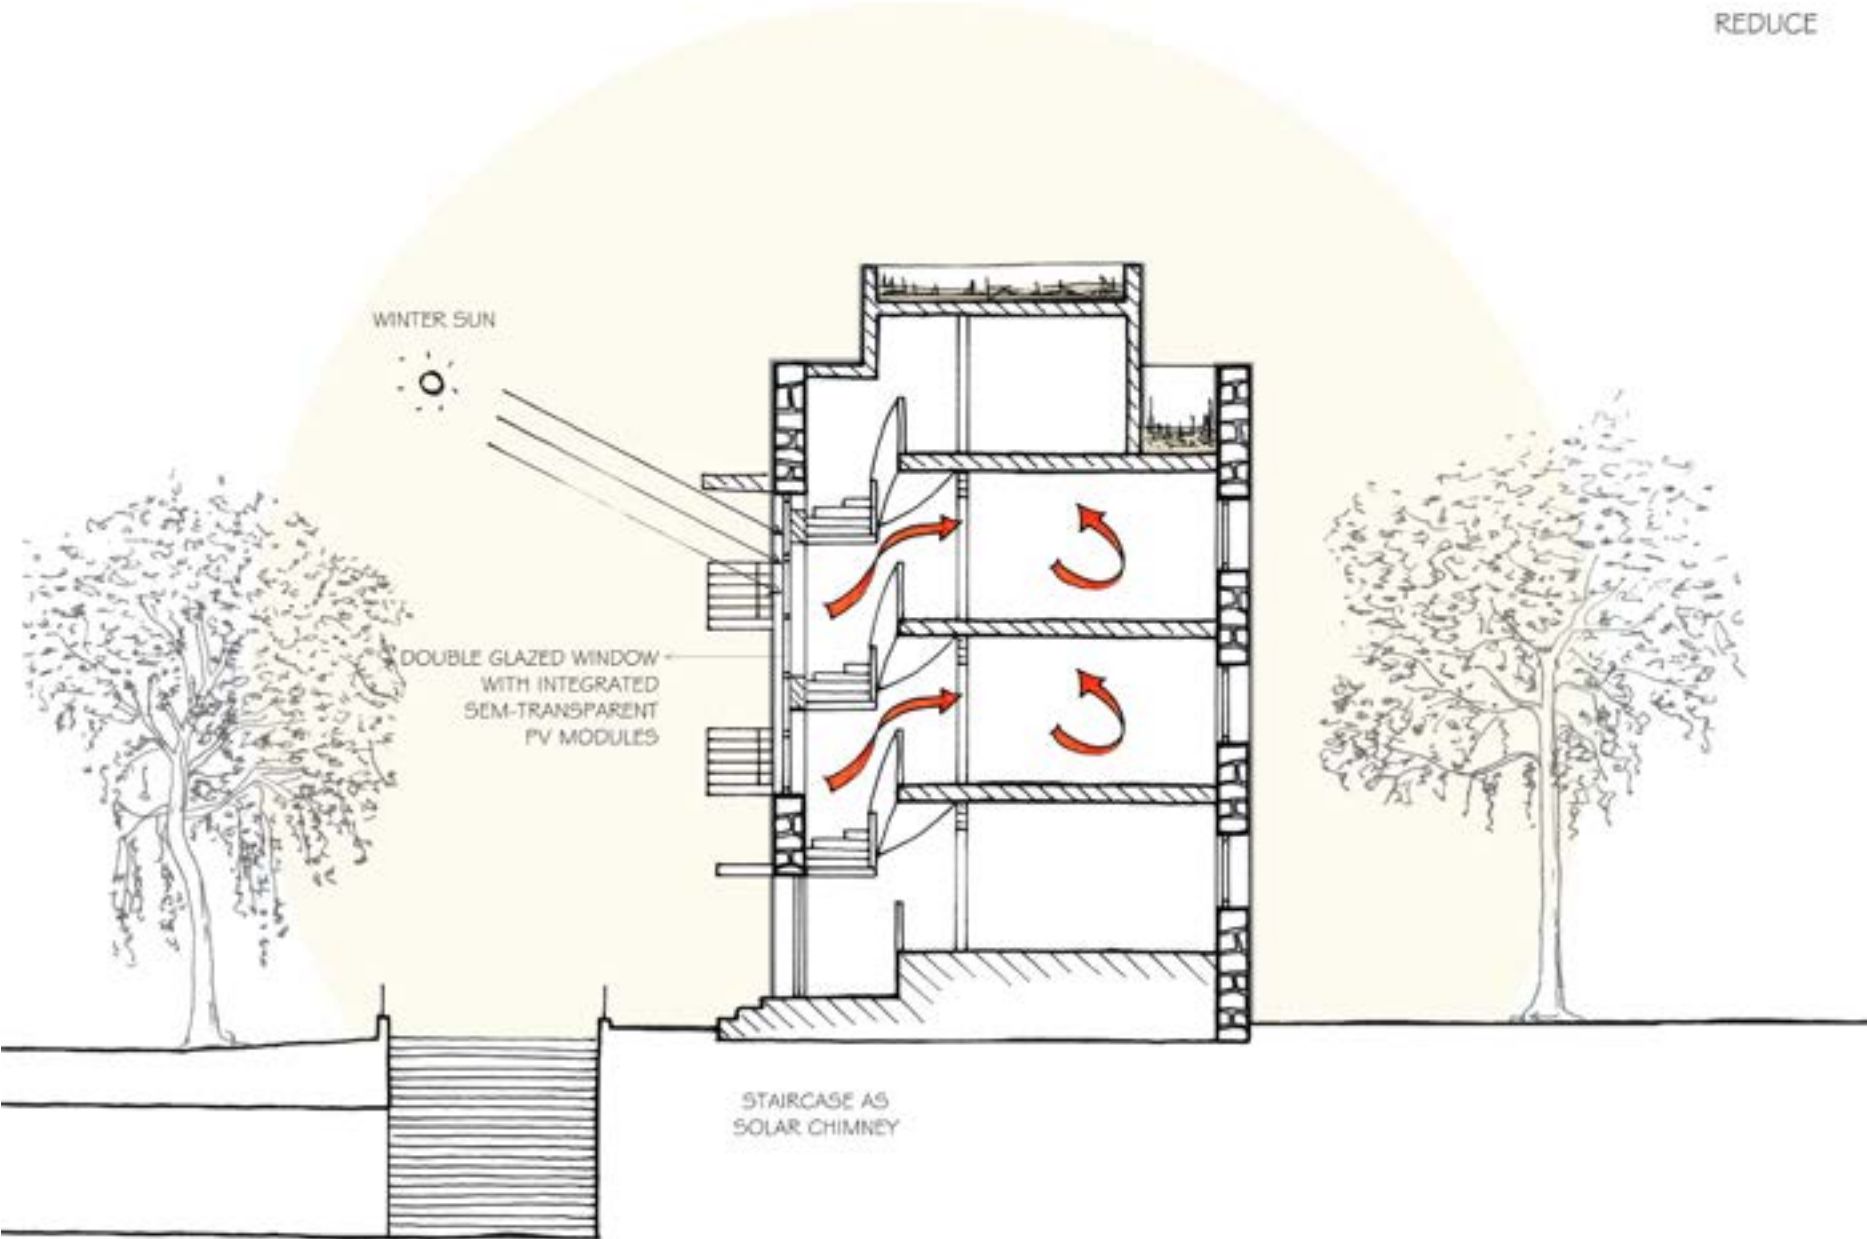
Author (2022). Section of the first building of Prosfygika - Reduce (solar chimney, winter) [Sketch].
